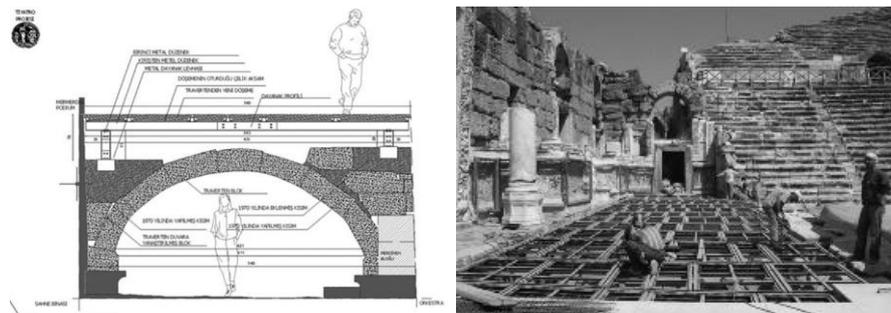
Reconstruction of the floor of the scaenae frons by architect Paolo Mighetto (D'Andria 2008:422–423)
